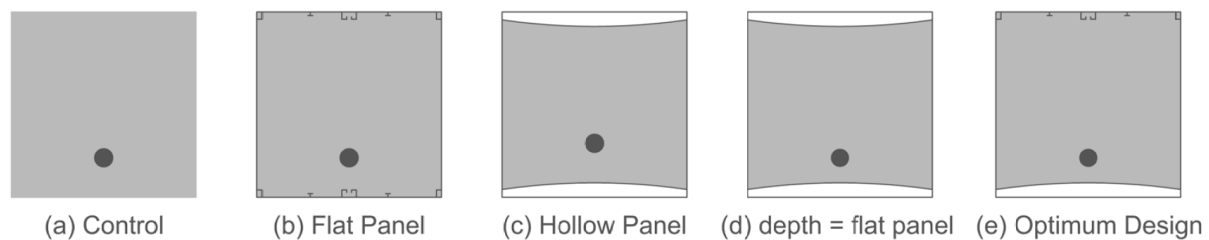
Summary of tested (a-c) and modified (d, e) wall cross-sections.
